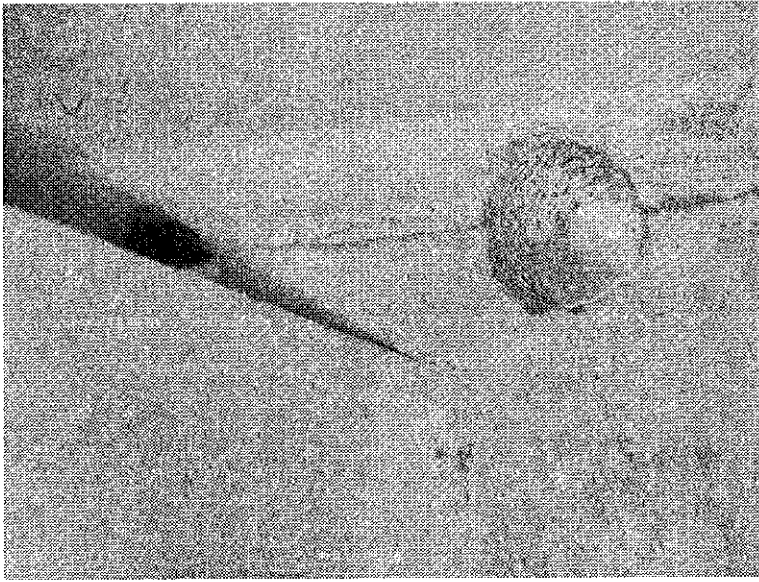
Typical drilled hole retrofit in web with continued cracking.
